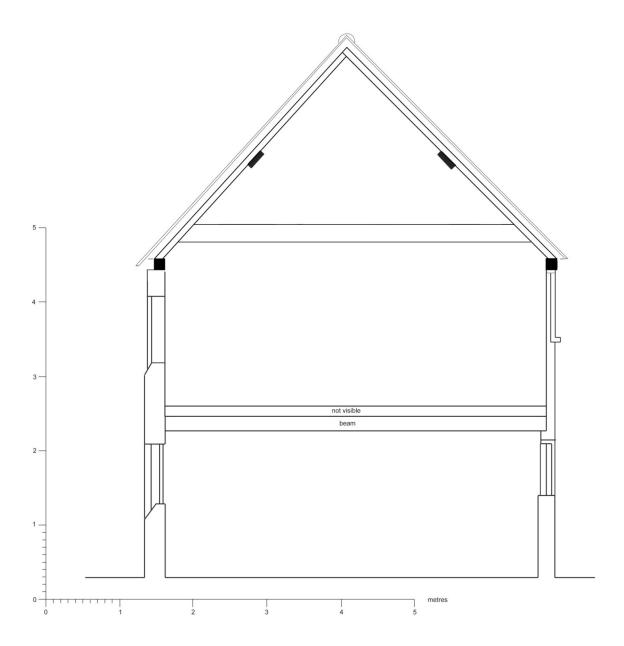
Pipers Cottage, section A-A. After K Halls, redrawn by M D Wilson
